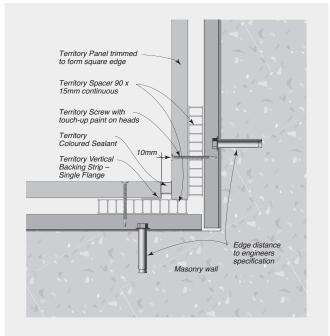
Internal Corner Detail – with Backing Strip and Coloured Sealant
